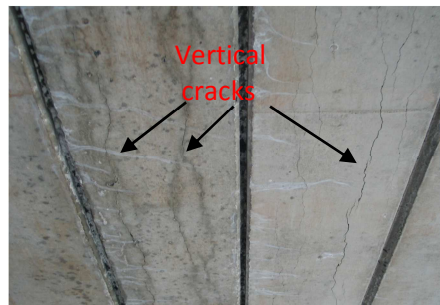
The Cracking of hollow-core type pre-tensioned PC girder
